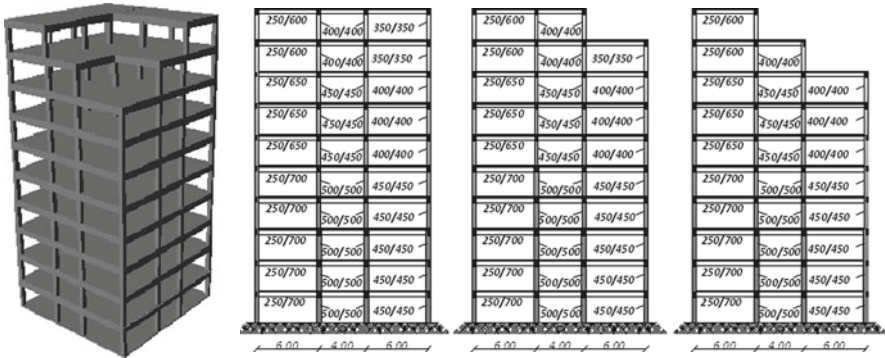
Three-dimensional view (left) and geometry of typical frames of 10-storey building
